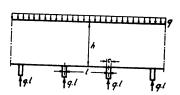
Continuous Beam Resting on Multiple Supports. Point of Load in Midspan
